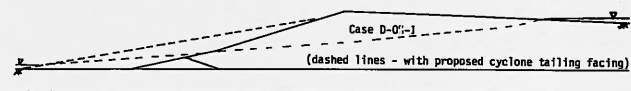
Effect of proposed cyclone tailing facing with infiltration -- lower pool elevation at 10,700 feet.
